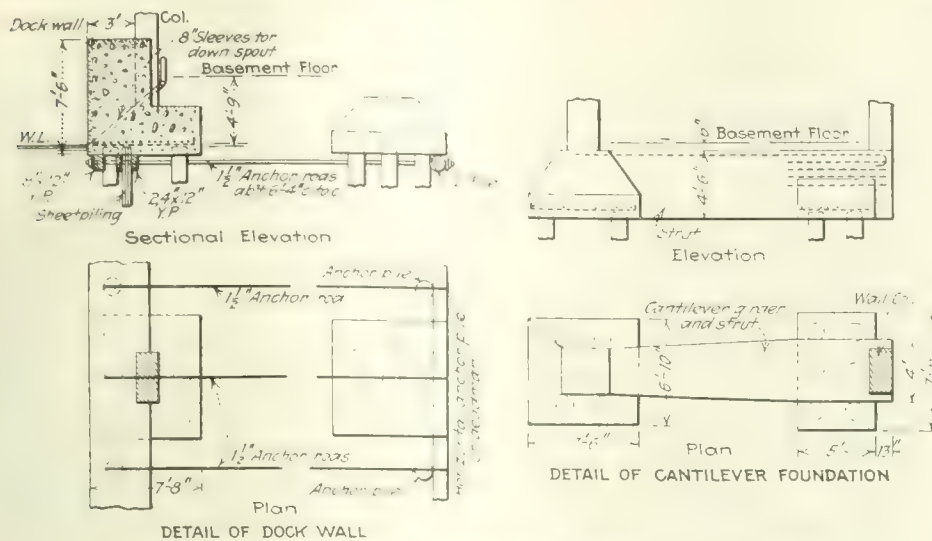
DOCK WALL AND CANTILEVER FOUNDATION GIRDERS
